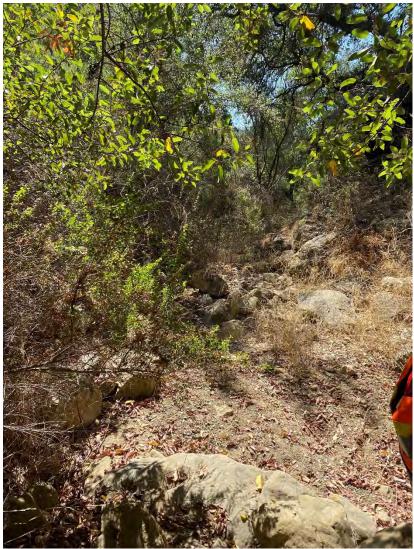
PM 26.76 channel condition below outlet and concrete apron. The streambed is a mixture of sand, gravel, cobble and boulders, with oak overhanging.
